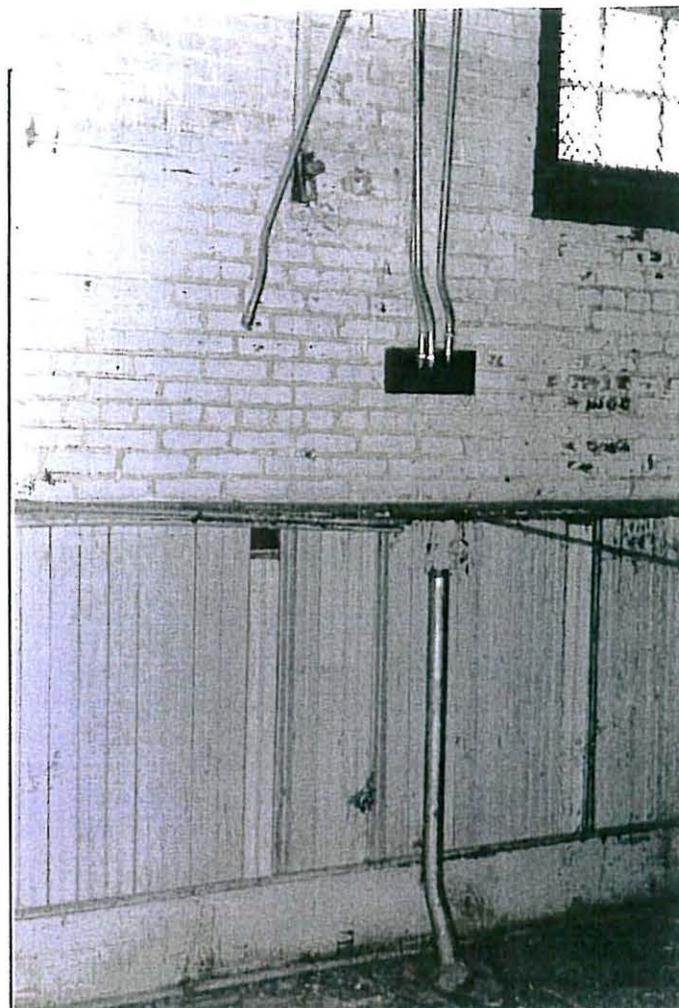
Site of second generation subpanel on east wall of room 201. Note disengaged main feeder conduit below and branch circuit conduit above
